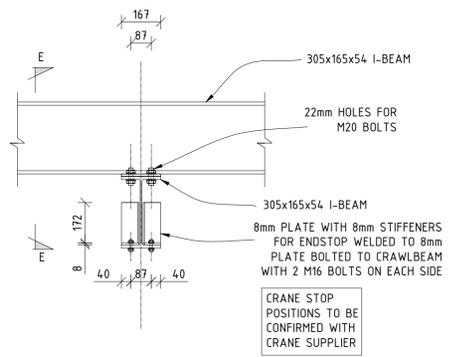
BEAM COLUMN CONNECTION (TYPICAL)
